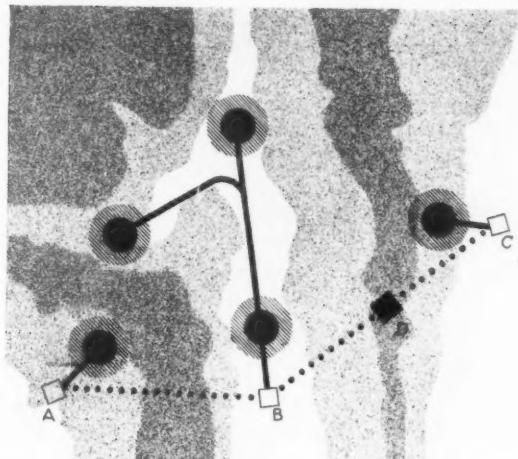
Drainage of five villages by combination of hydraulic sewers and sludge mains. The hydraulic sewers (solid line) pick up village gravity sewers and run direct to sludge separation works A, B and C, whence sludge mains (dotted line) carry sludge to treatment works D. Building development can only take place from existing centres
